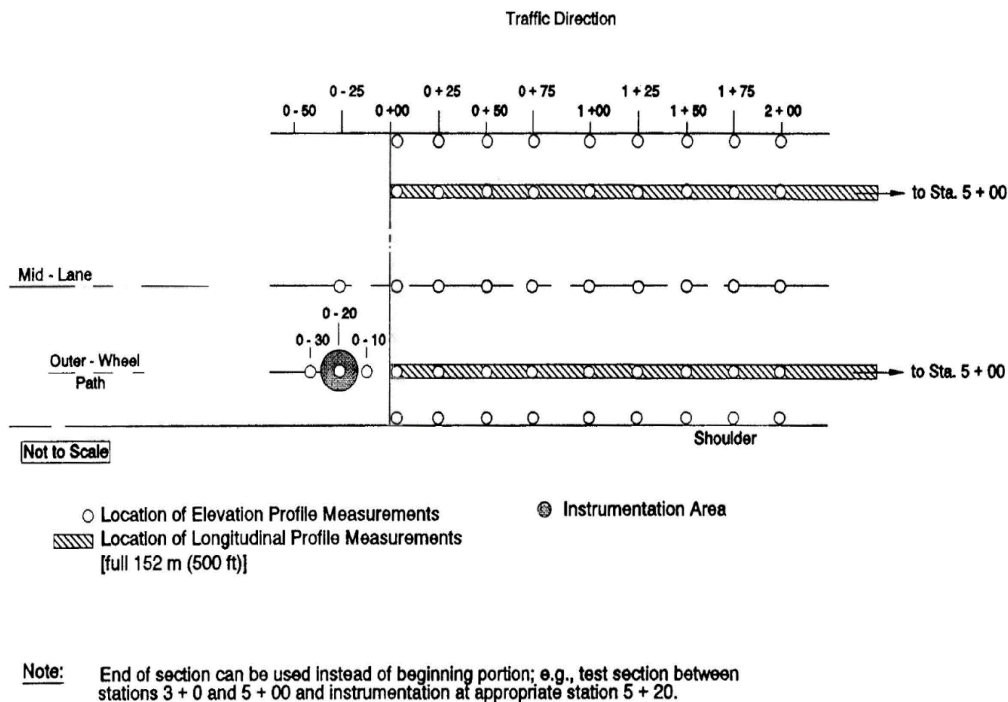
Elevation and Profile Data Collection Plan -AC Pavements (Rada et al., 1994)
